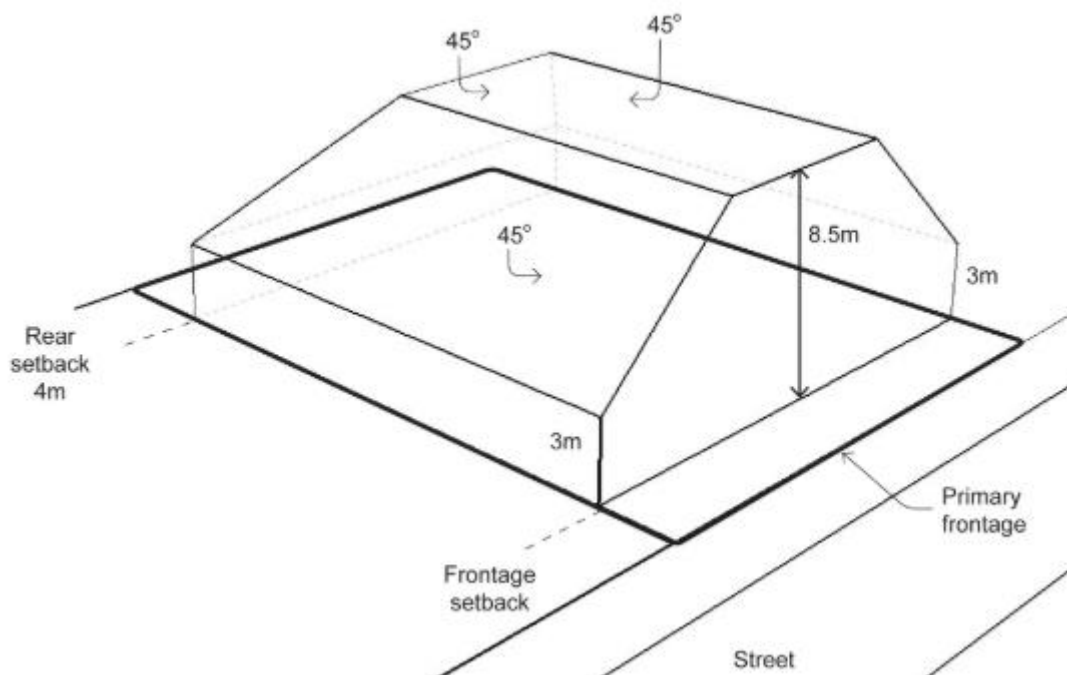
Building envelope designated by 10.4.2 A3 (a)
